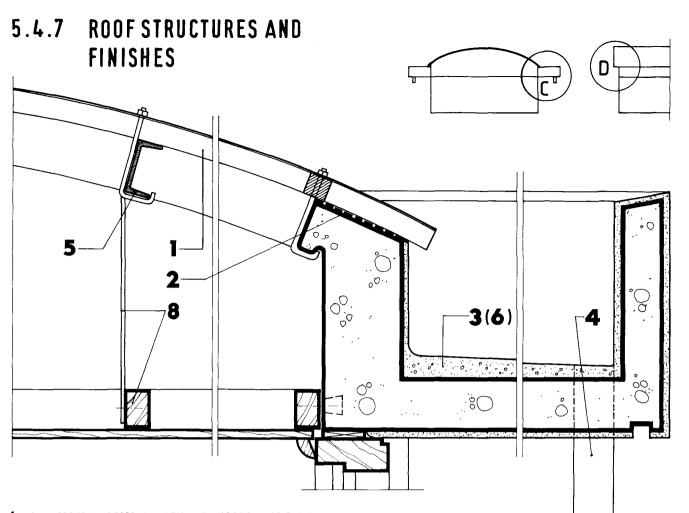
SELF - SUPPORTING ALUMINIUM ARCHES (OPEN, WITH REINFORCED CONCRETE ROOF SLAB)
